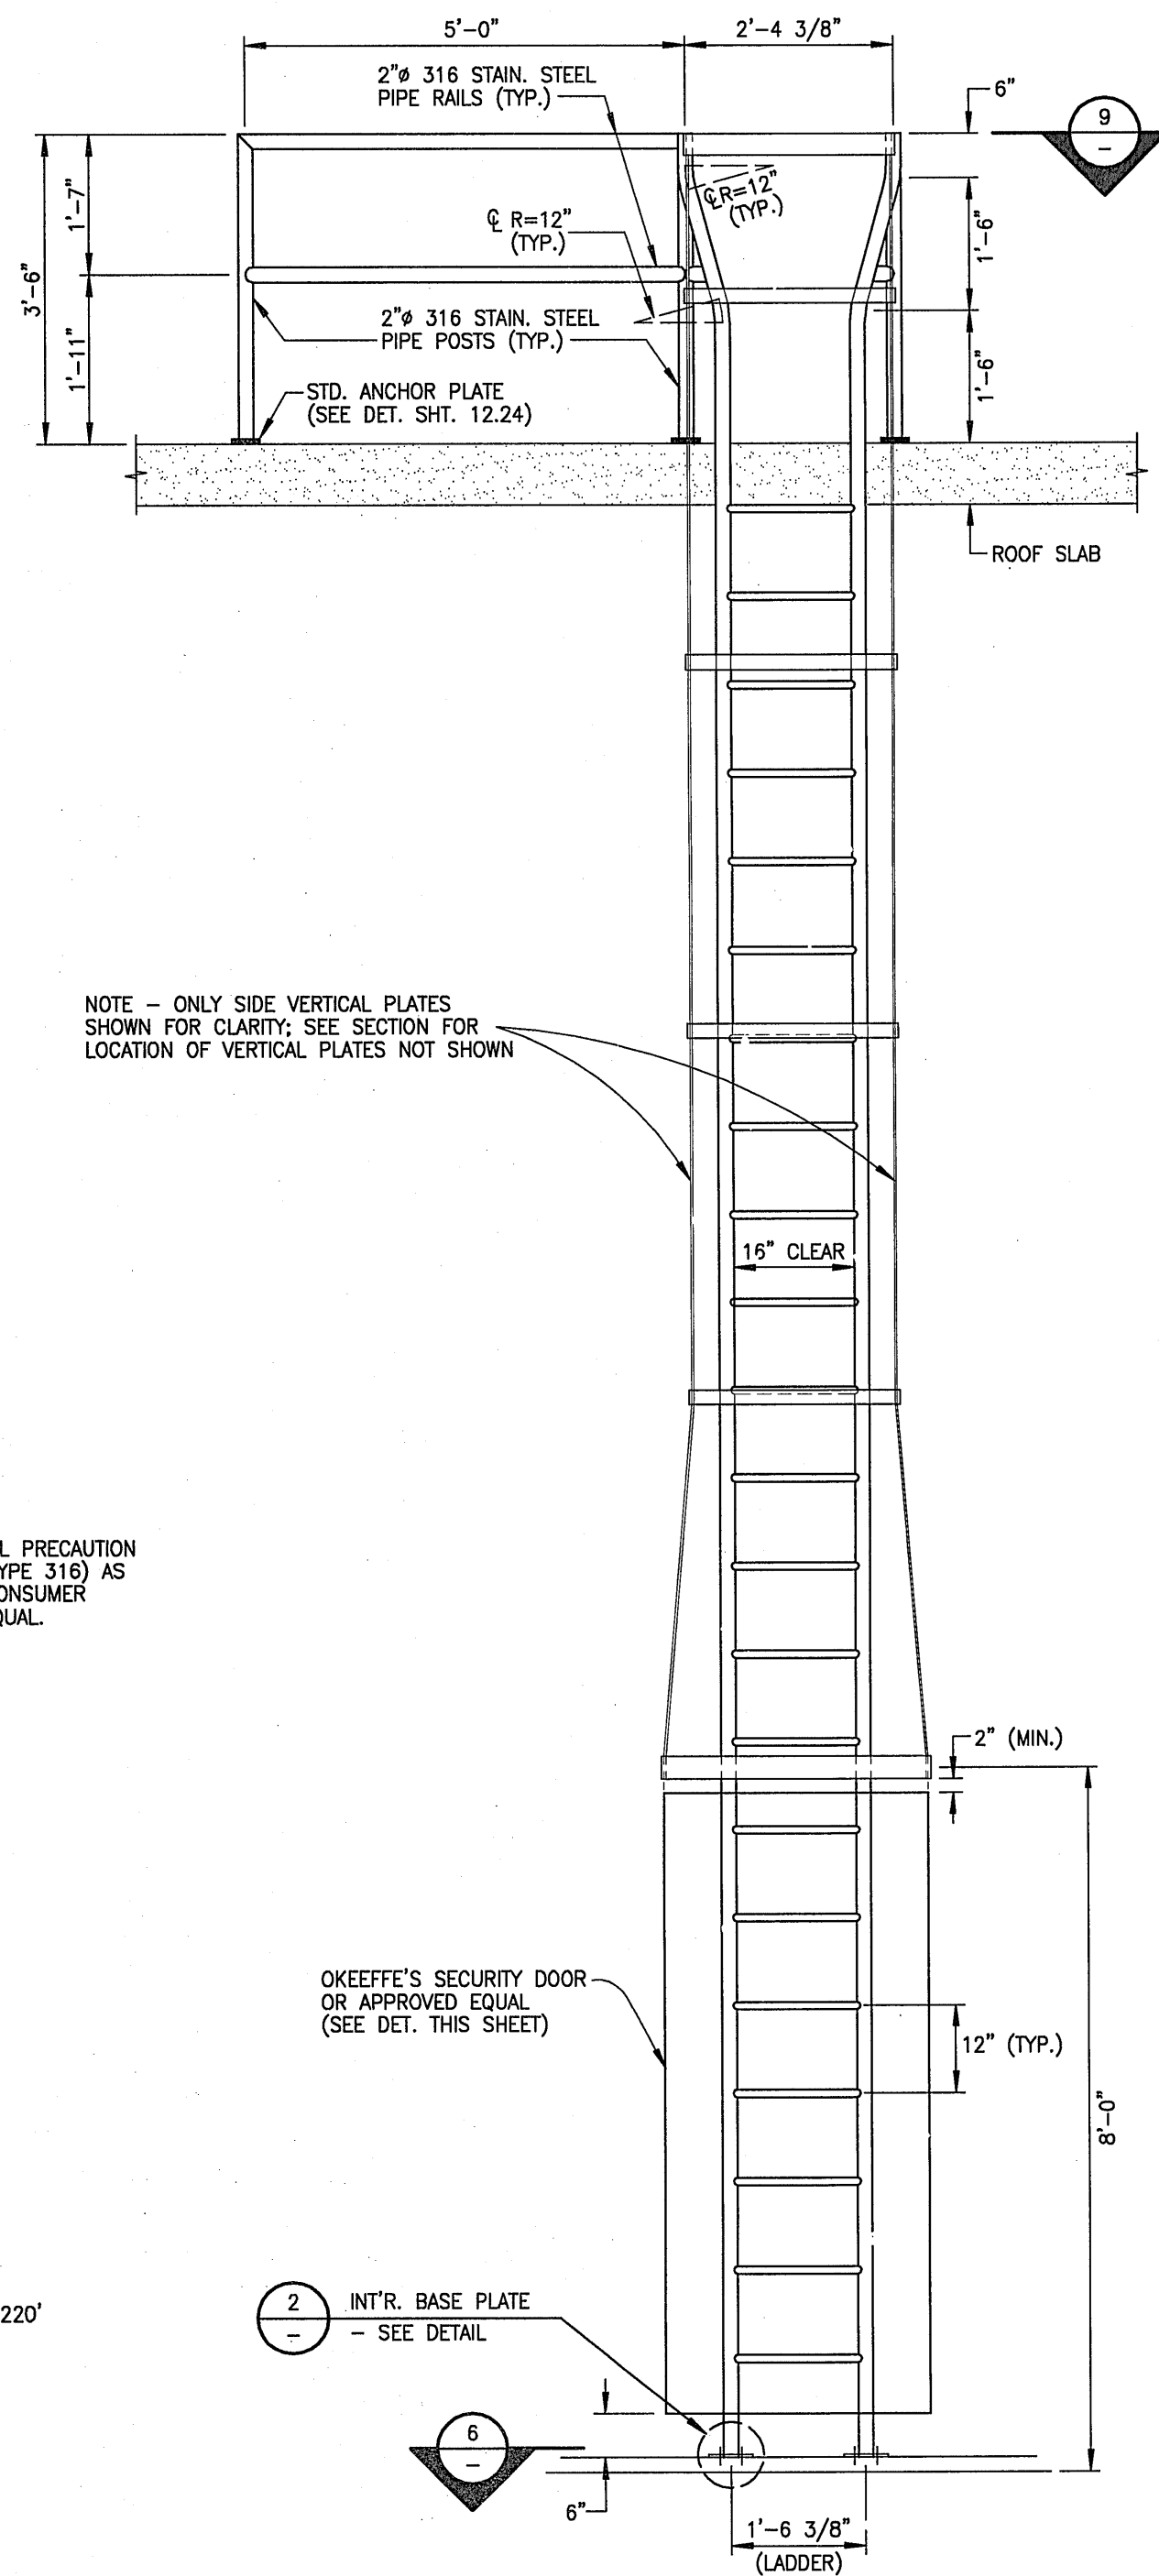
DETAIL - CLIMB PREVENTIVE SECURITY DOOR (4)
